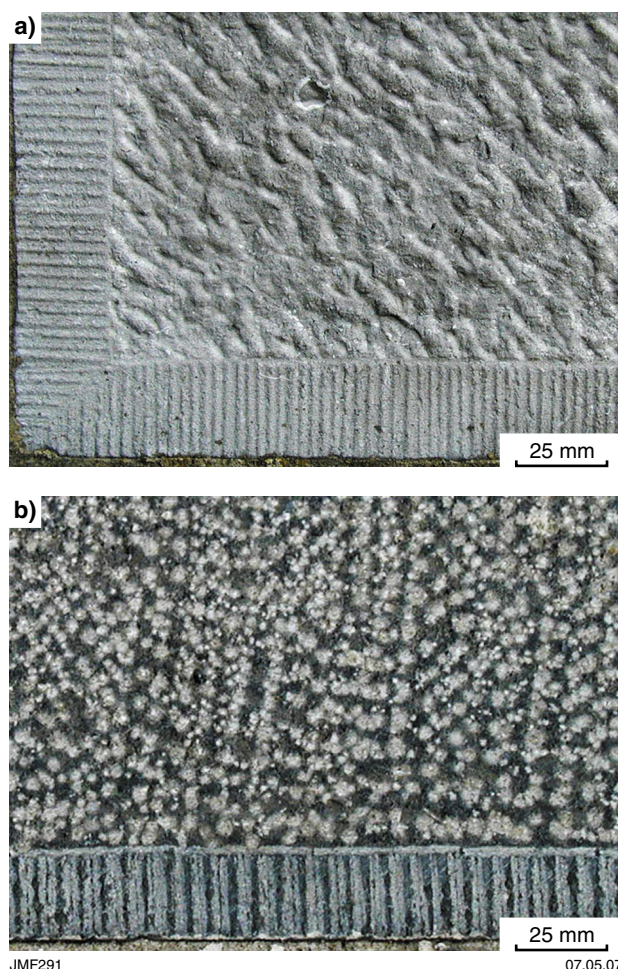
Black marble blocks showing two styles of bush hammering. Surrounded by chiselled margins, both styles are designed for use as kerbstones with non-slip surfaces: a) medium- to coarse-textured pits; b) regularly spaced, sunken dots
